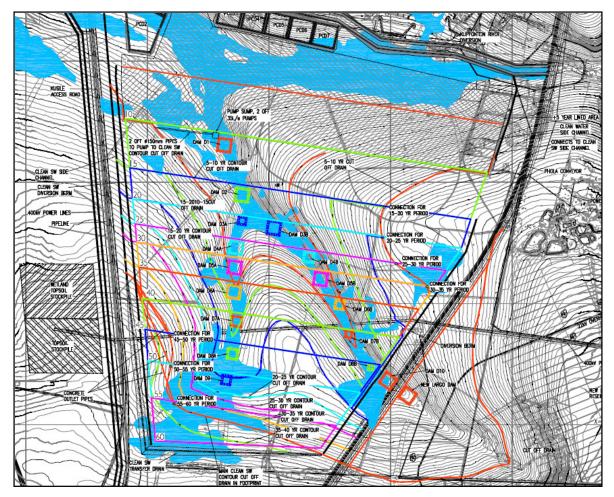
Layout of Clean Storm Water Dams and Pollution Control Dams
